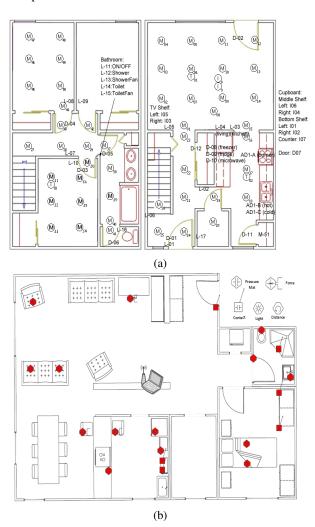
Floor plans and sensor layout (a) Casas WSU testbed (b) Aras House B
